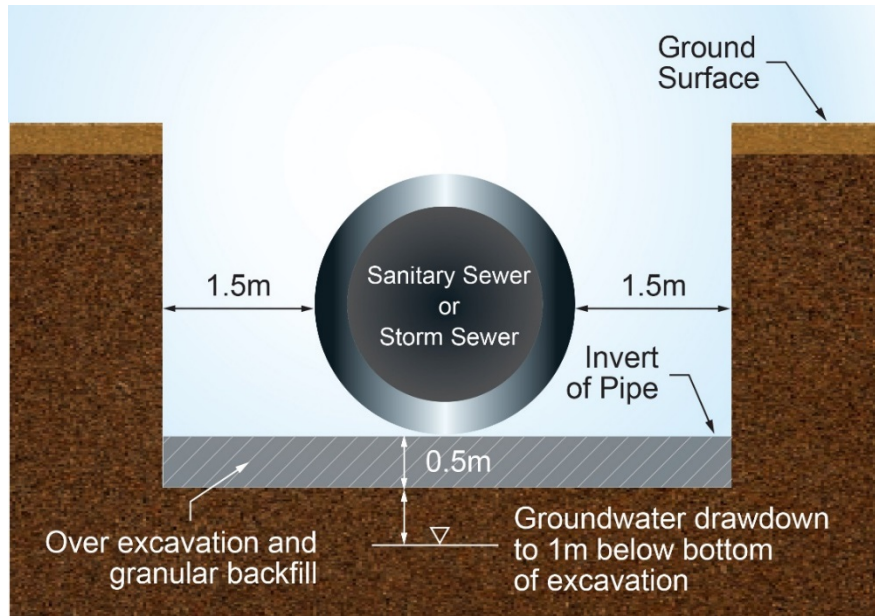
Schematic Diagram of Trench Excavation for Sanitary and Storm Sewer Construction
